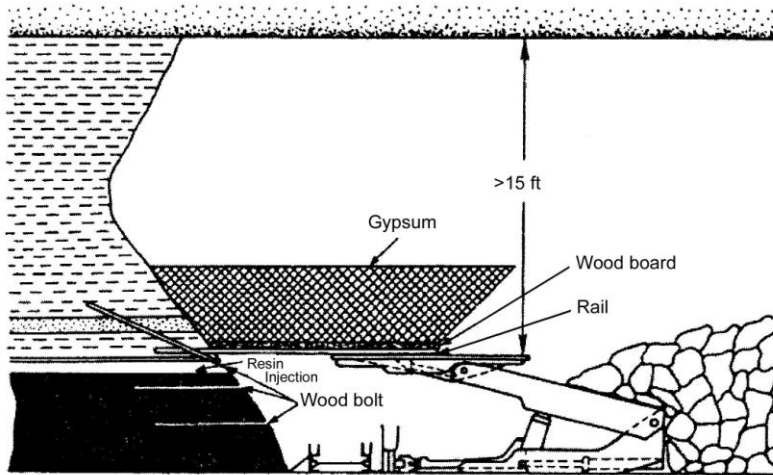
False roof built to pass through a very large roof fall (Peng and Chiang, 1984)
